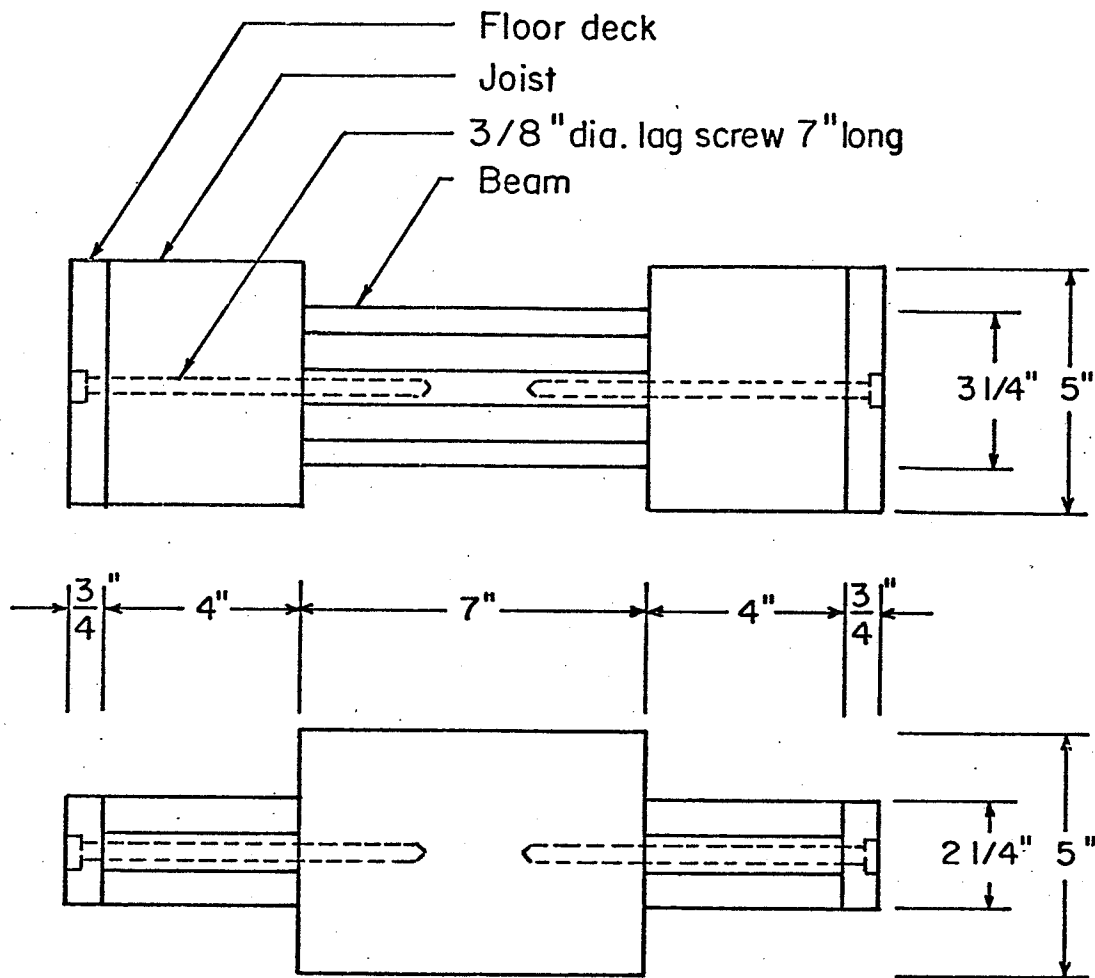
Details of Specimen for Shear Test Between Particleboard and Lag Screw.
